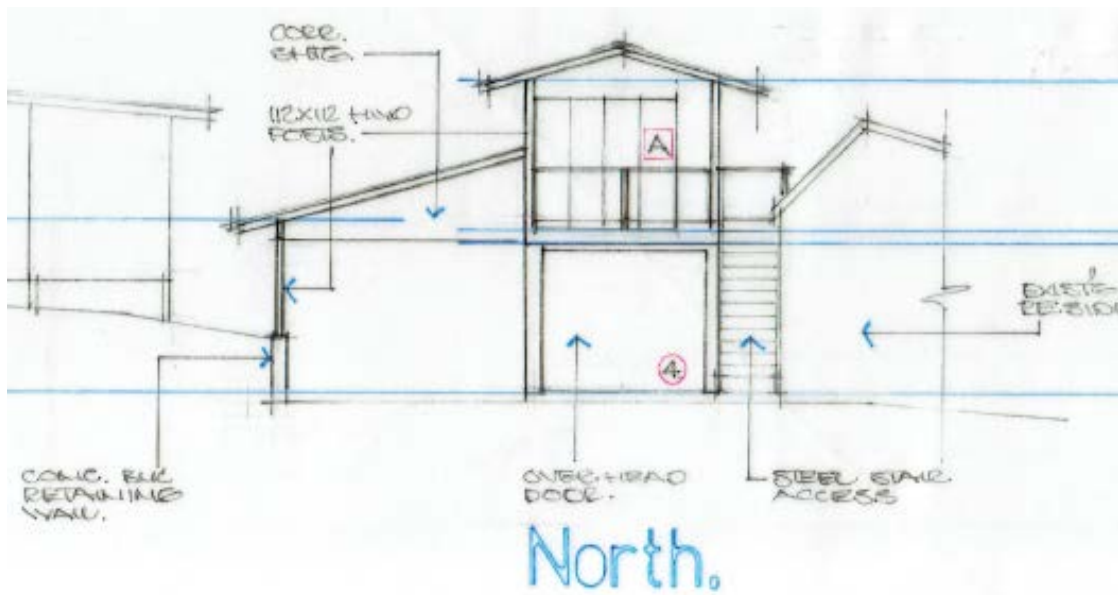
Northern elevation of secondary dwelling (Brunswick Heads Building Designers)
